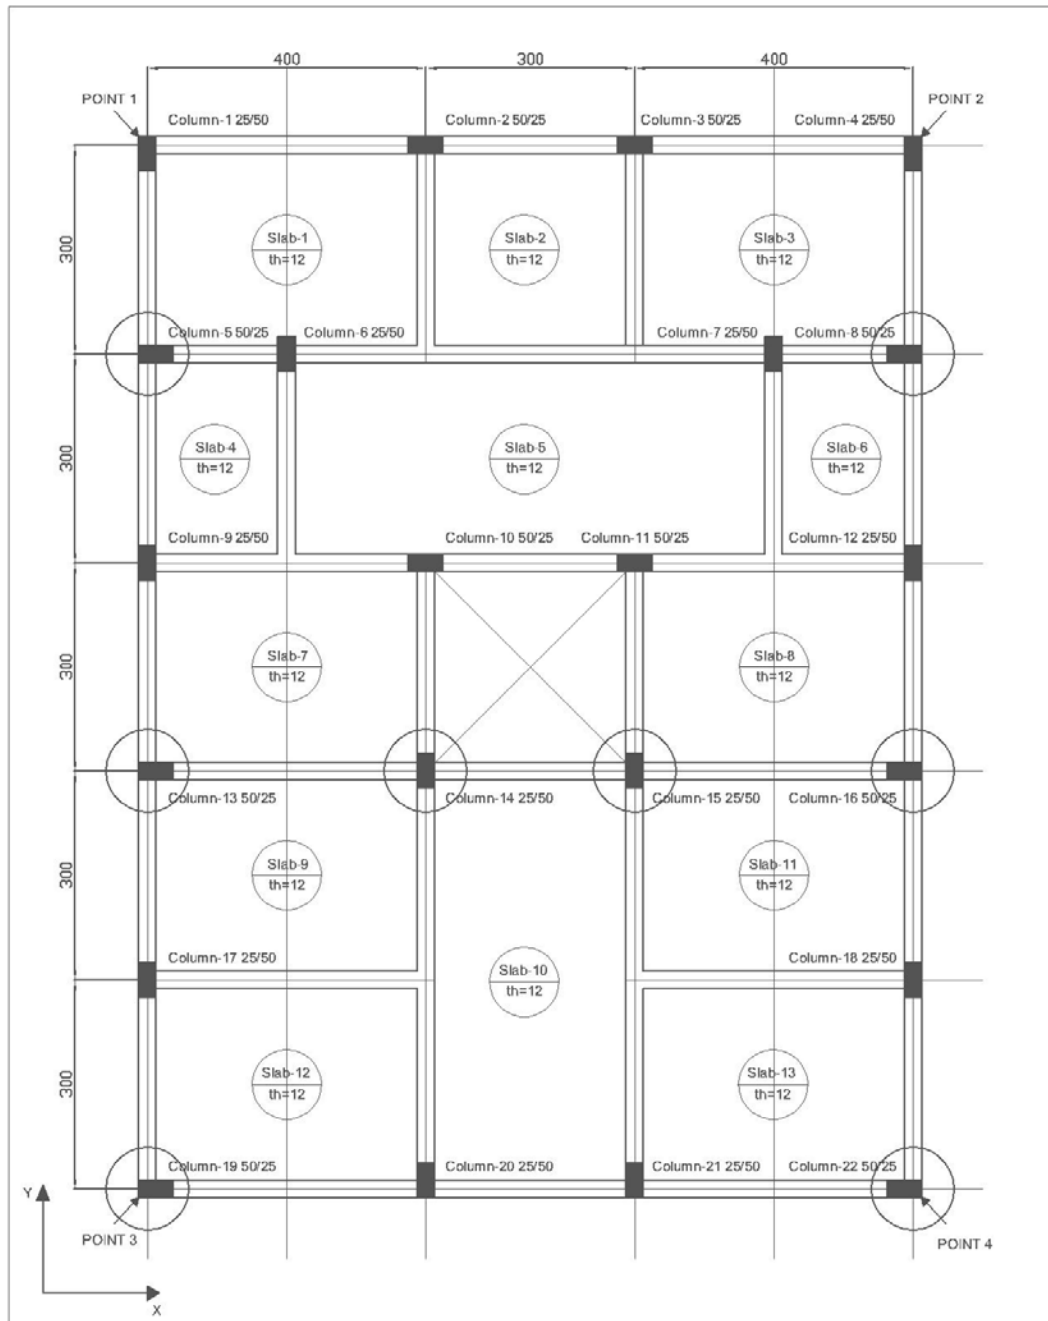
Structural Plan of Idealized Parametric Model-E
